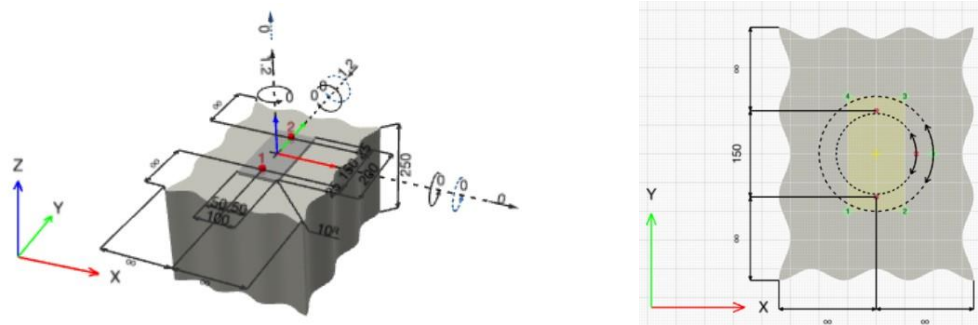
Baseplate connections using post-installed adhesive anchors
